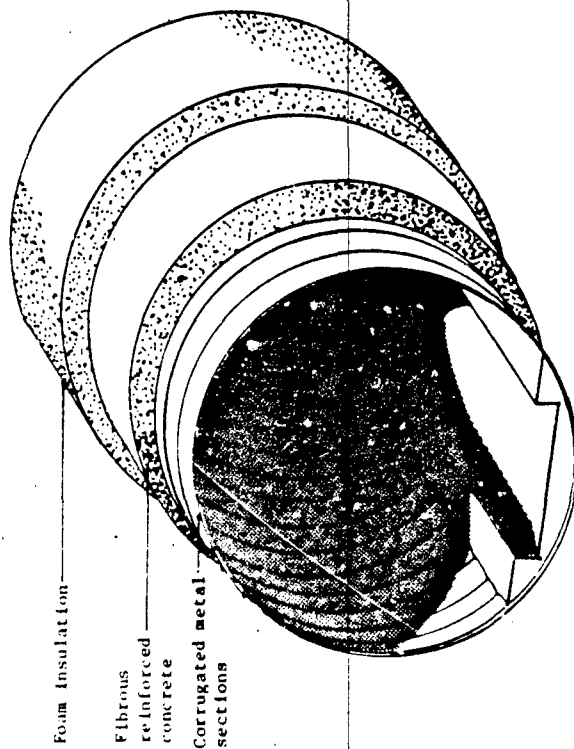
CORRUGATED METAL, FOAM, AND FIBROUS CONCRETE CONSTRUCTION.
